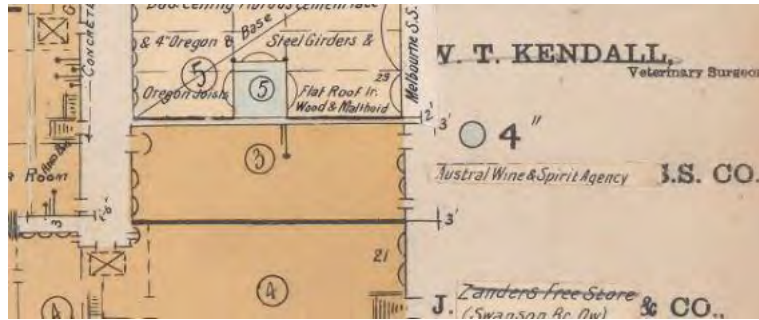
Detail from 1910 Mahlsted plan shows the current building on the subject site. In 1910 25 King Street was still occupied by the Melbourne Shipping Co., despite a tab for 'Austral Wine & Spirit Agency' blocking out the business name on the above plan. (Mahlsted Map, no 24, 1910)
